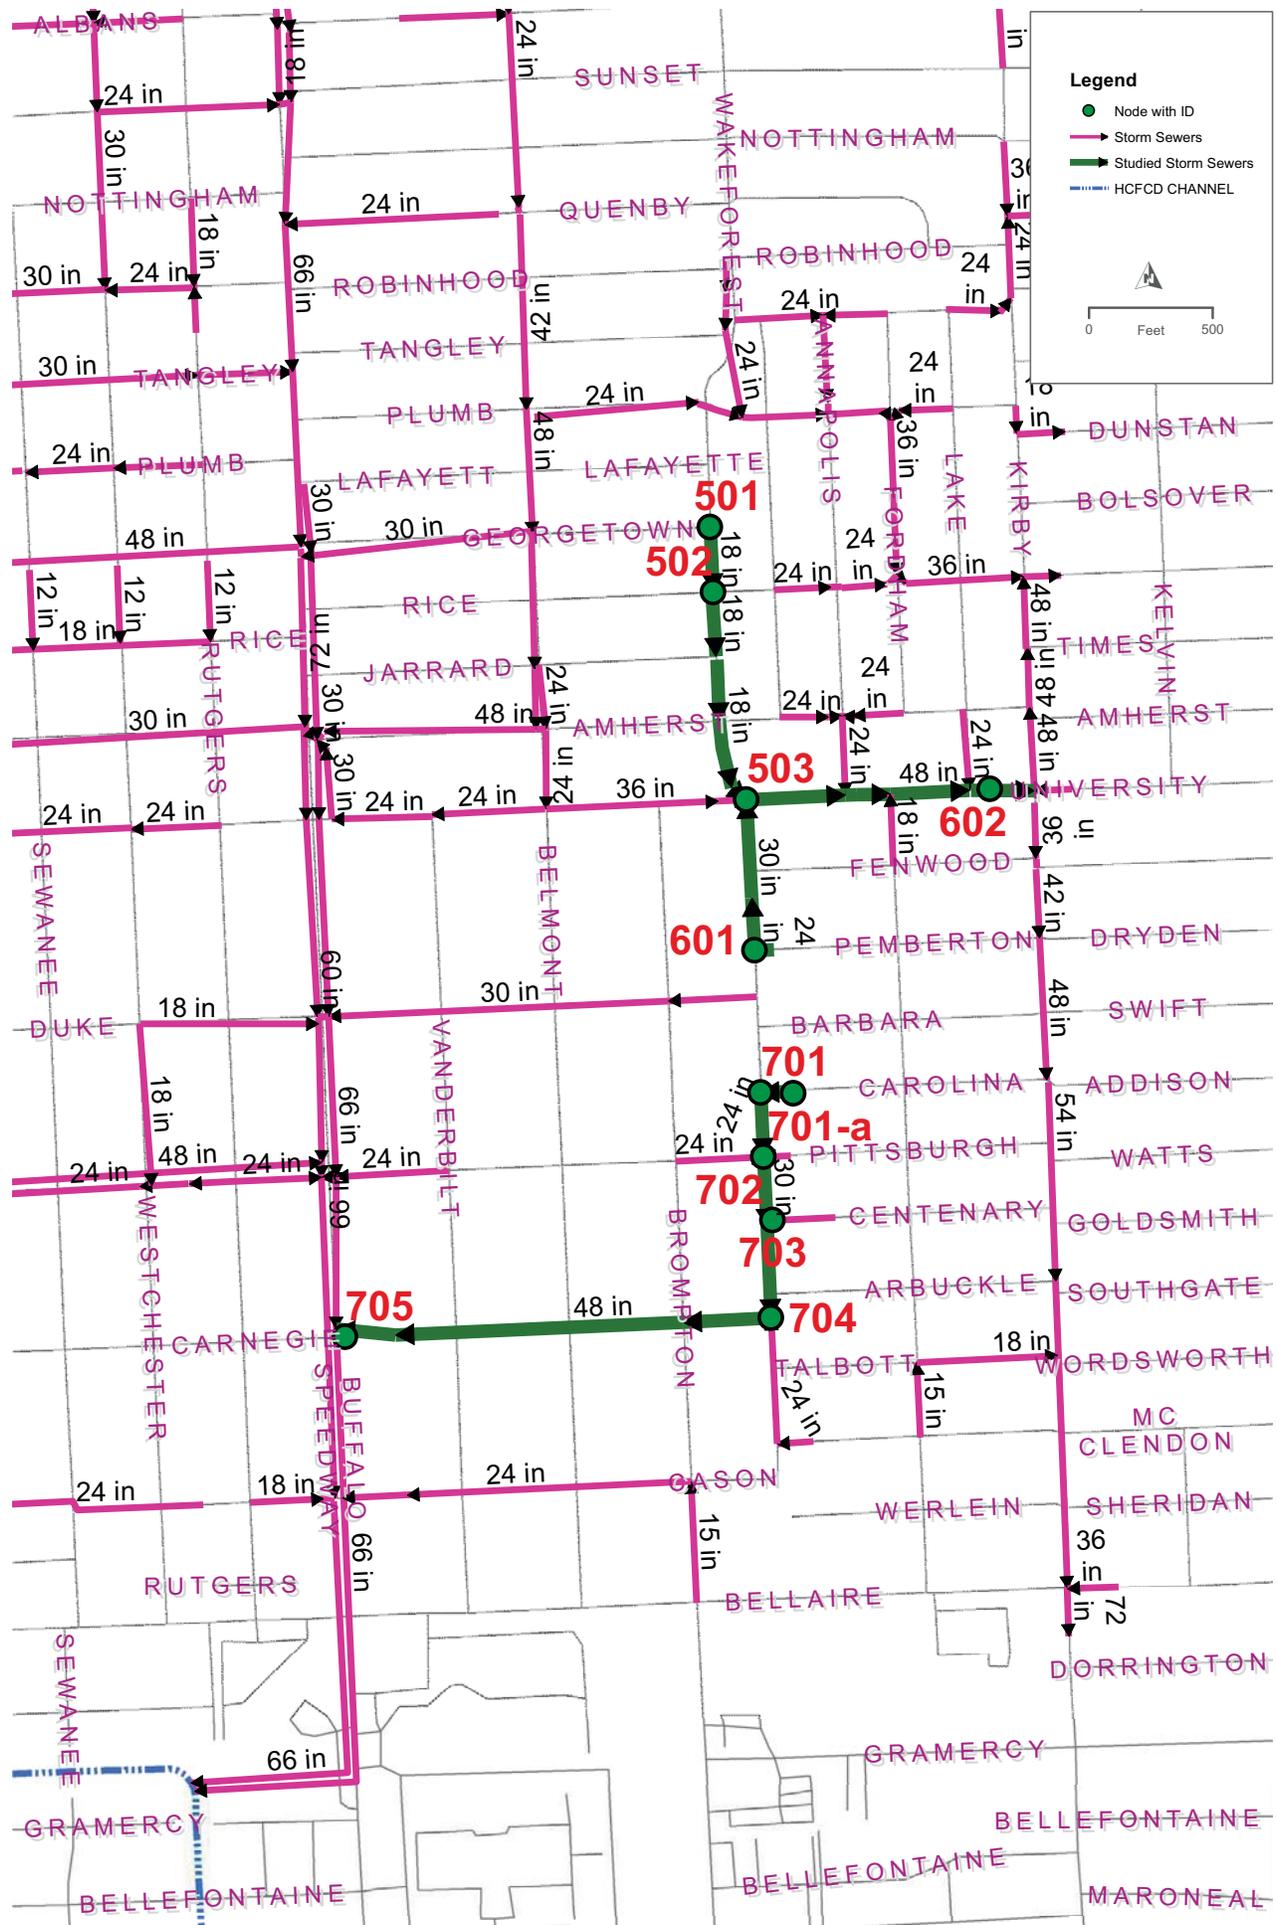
STORM SEWER LAYOUT IN PROJECT AREA
